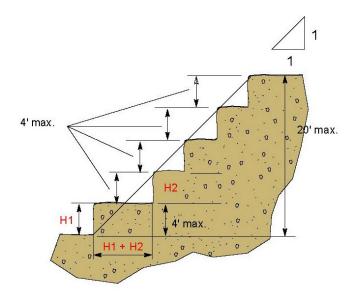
Type B soil, multiple-bench excavation (partial view)
